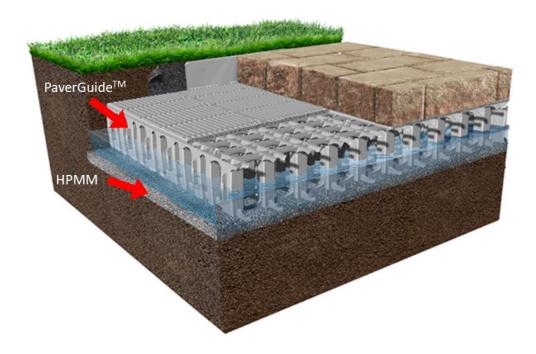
Cross section of Treatment permeable pavement construction showing brick paver surface course, PaverGuideTM grid reservoir layer, and HPMM base layer (image provided courtesy of PaverGuide, Inc.).
